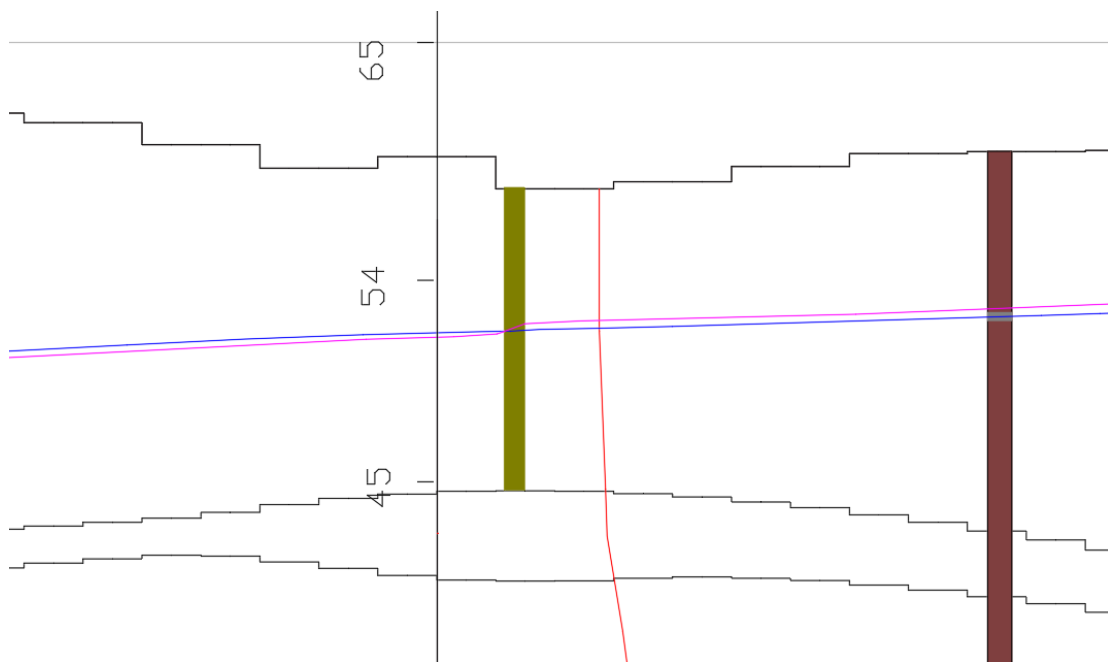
Longitudinal profile North-South (Column #73) detail. Measurement of the elevation of the water table upstream diaphragm wall: Elevation = 0.37 m. Dardistown Sector
